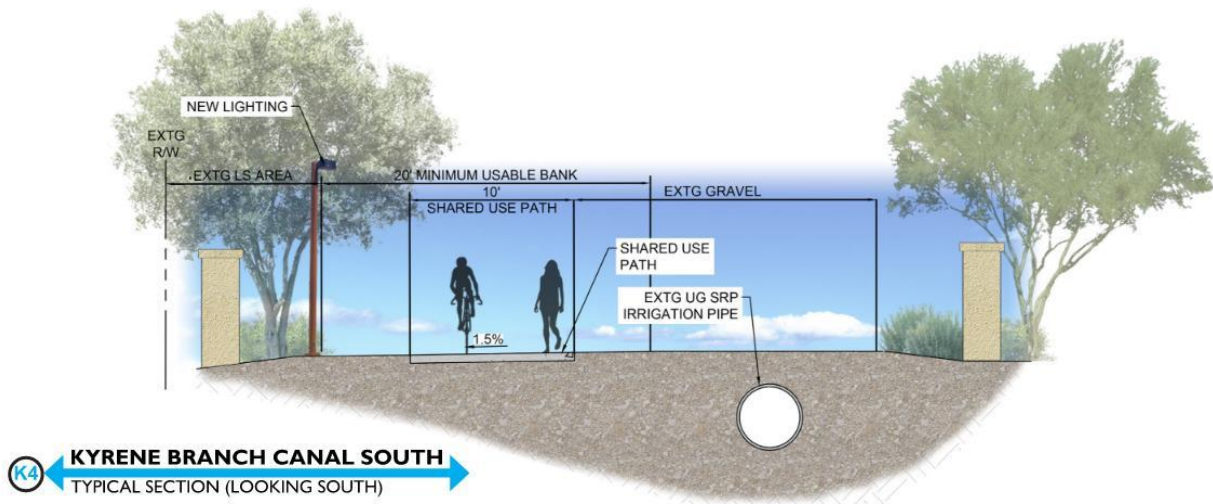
Shared Use Pathway Typical Section - Kyrene Branch Canal South - Segment K4
